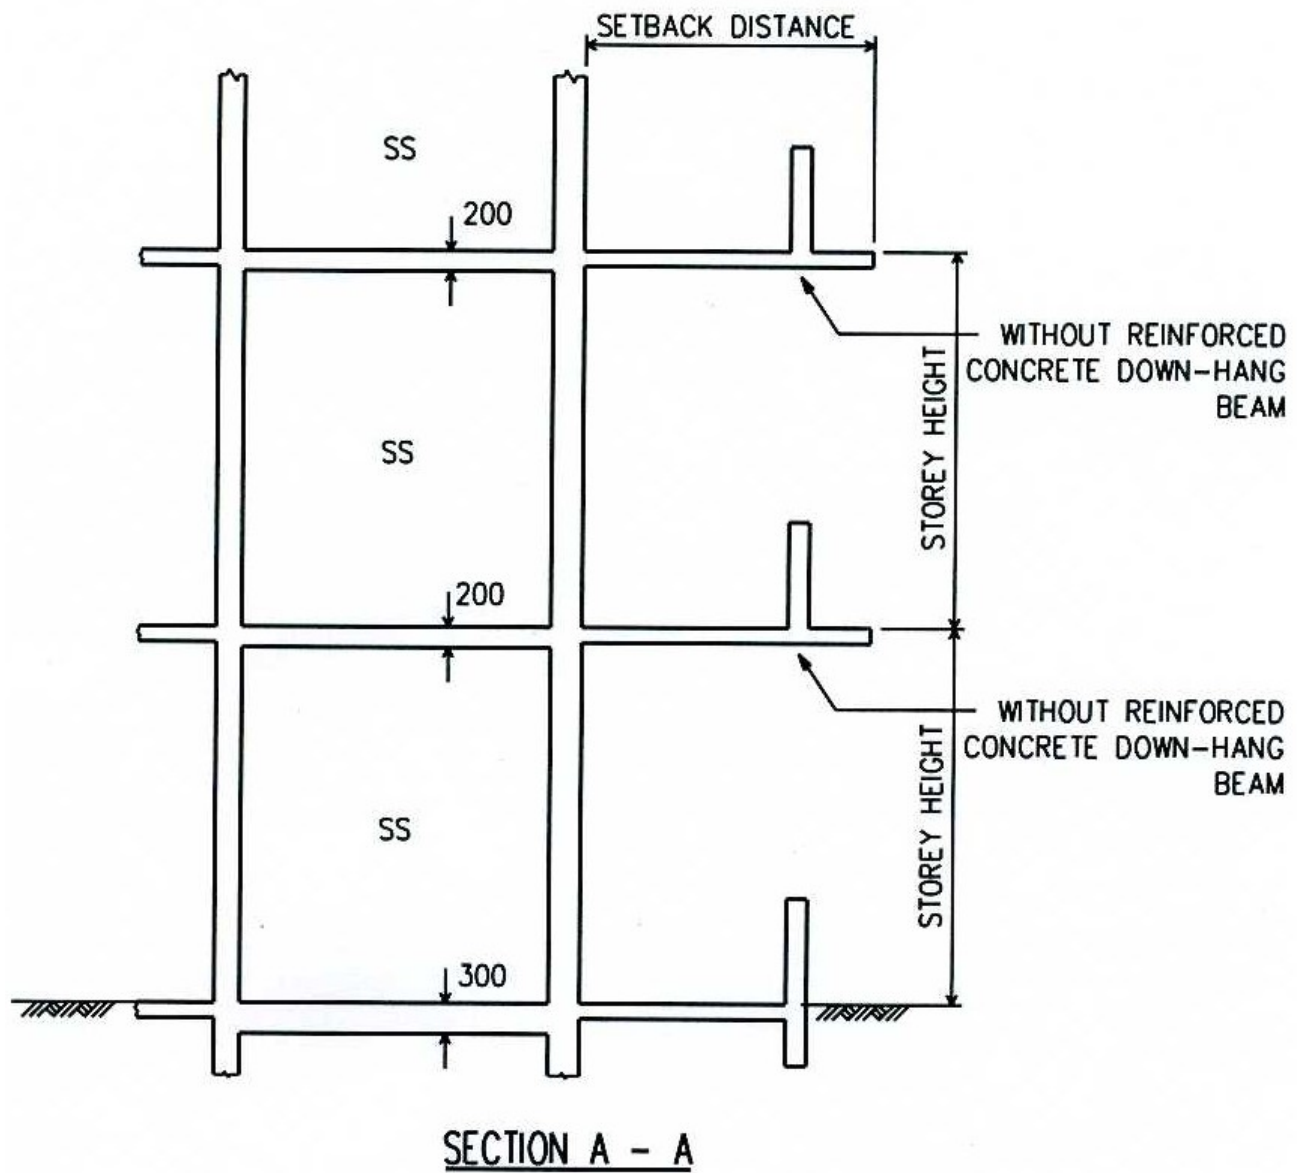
(c) SETBACK DISTANCE OF SS WALLS (WITHOUT DOWN-HANG BEAM)
